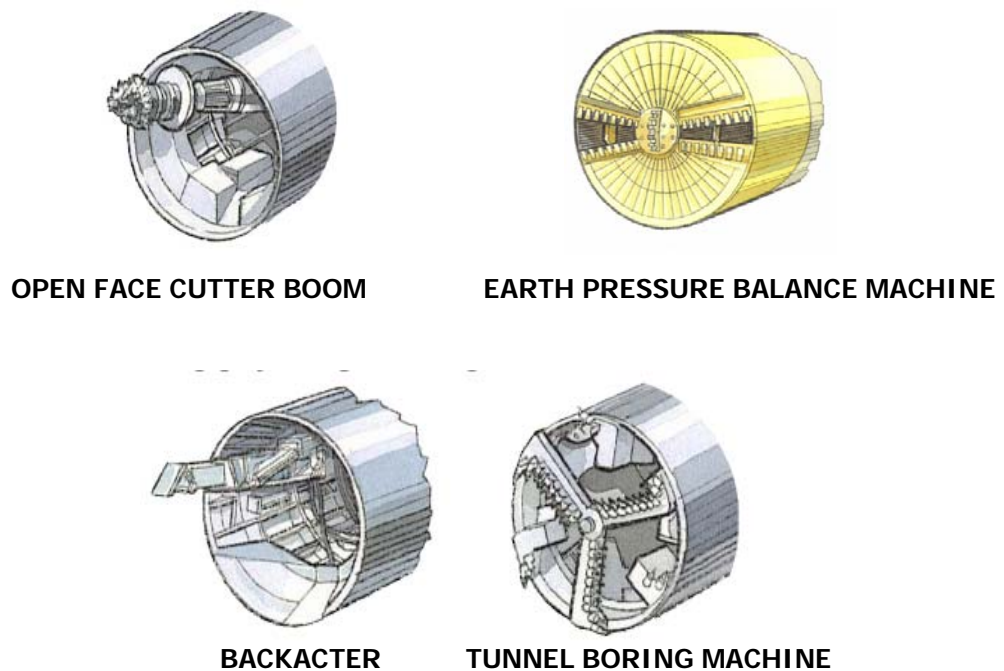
PIPE JACKING EXCAVATION METHODS
